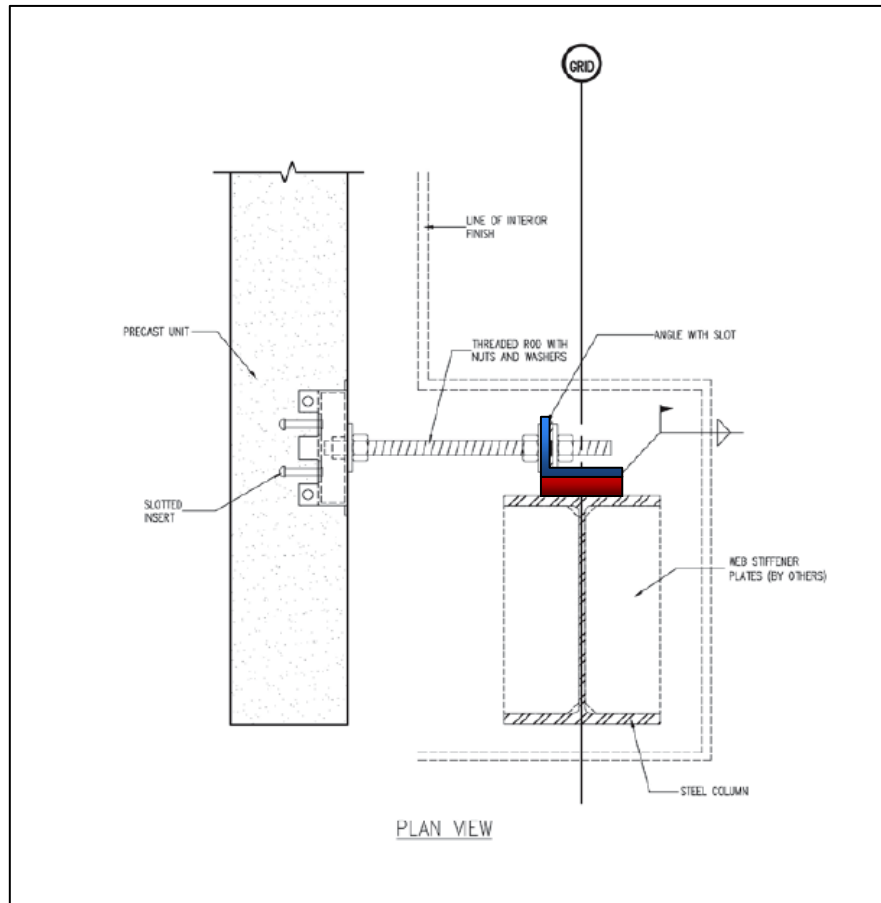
Plan view of a panel tie-back connection. The red represents a shim angle used to separate the column and the steel angle, shown in blue. Image from the NCPA Architectural Precast Connection Guide.
